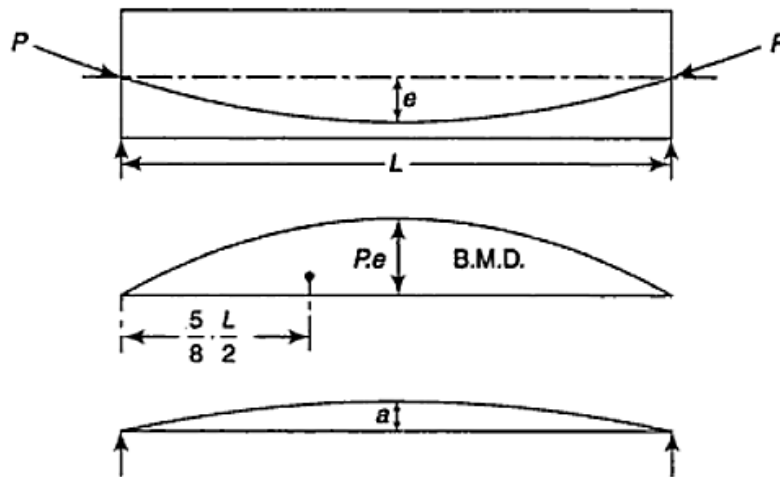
Camber of girder beam under eccentric parabolic tendon (central anchor)
